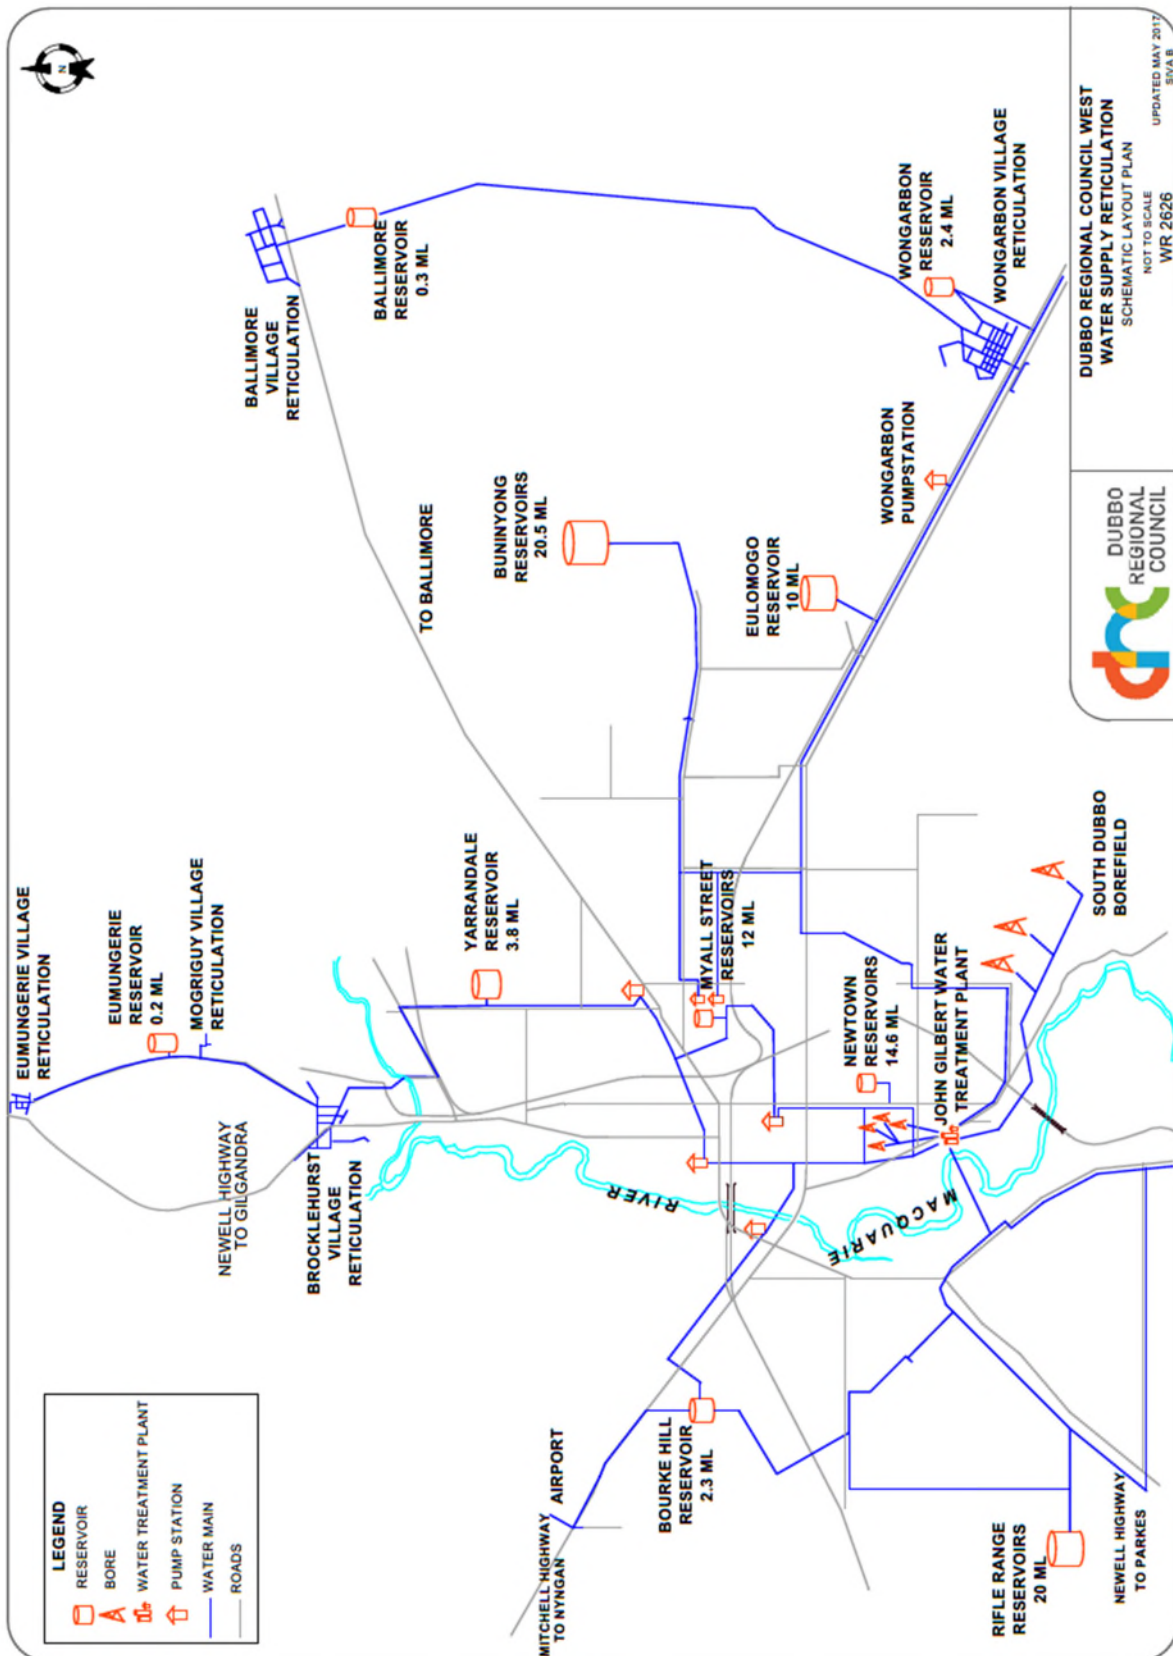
Dubbo Water Supply Reticulation Schematic Layout Plan
